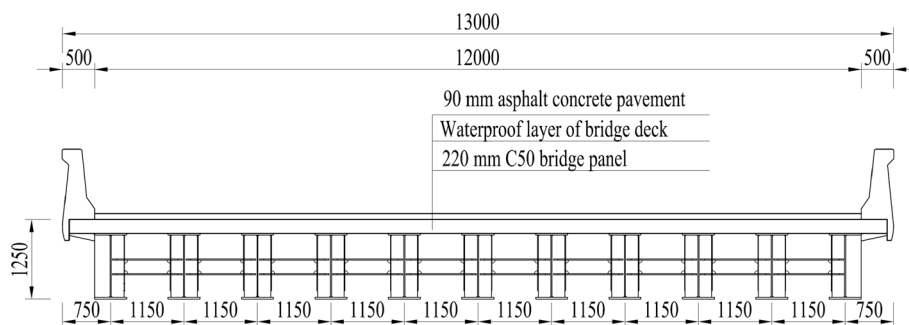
Standard cross-sectional layout of C50 ordinary steel–concrete composite beam (mm)
